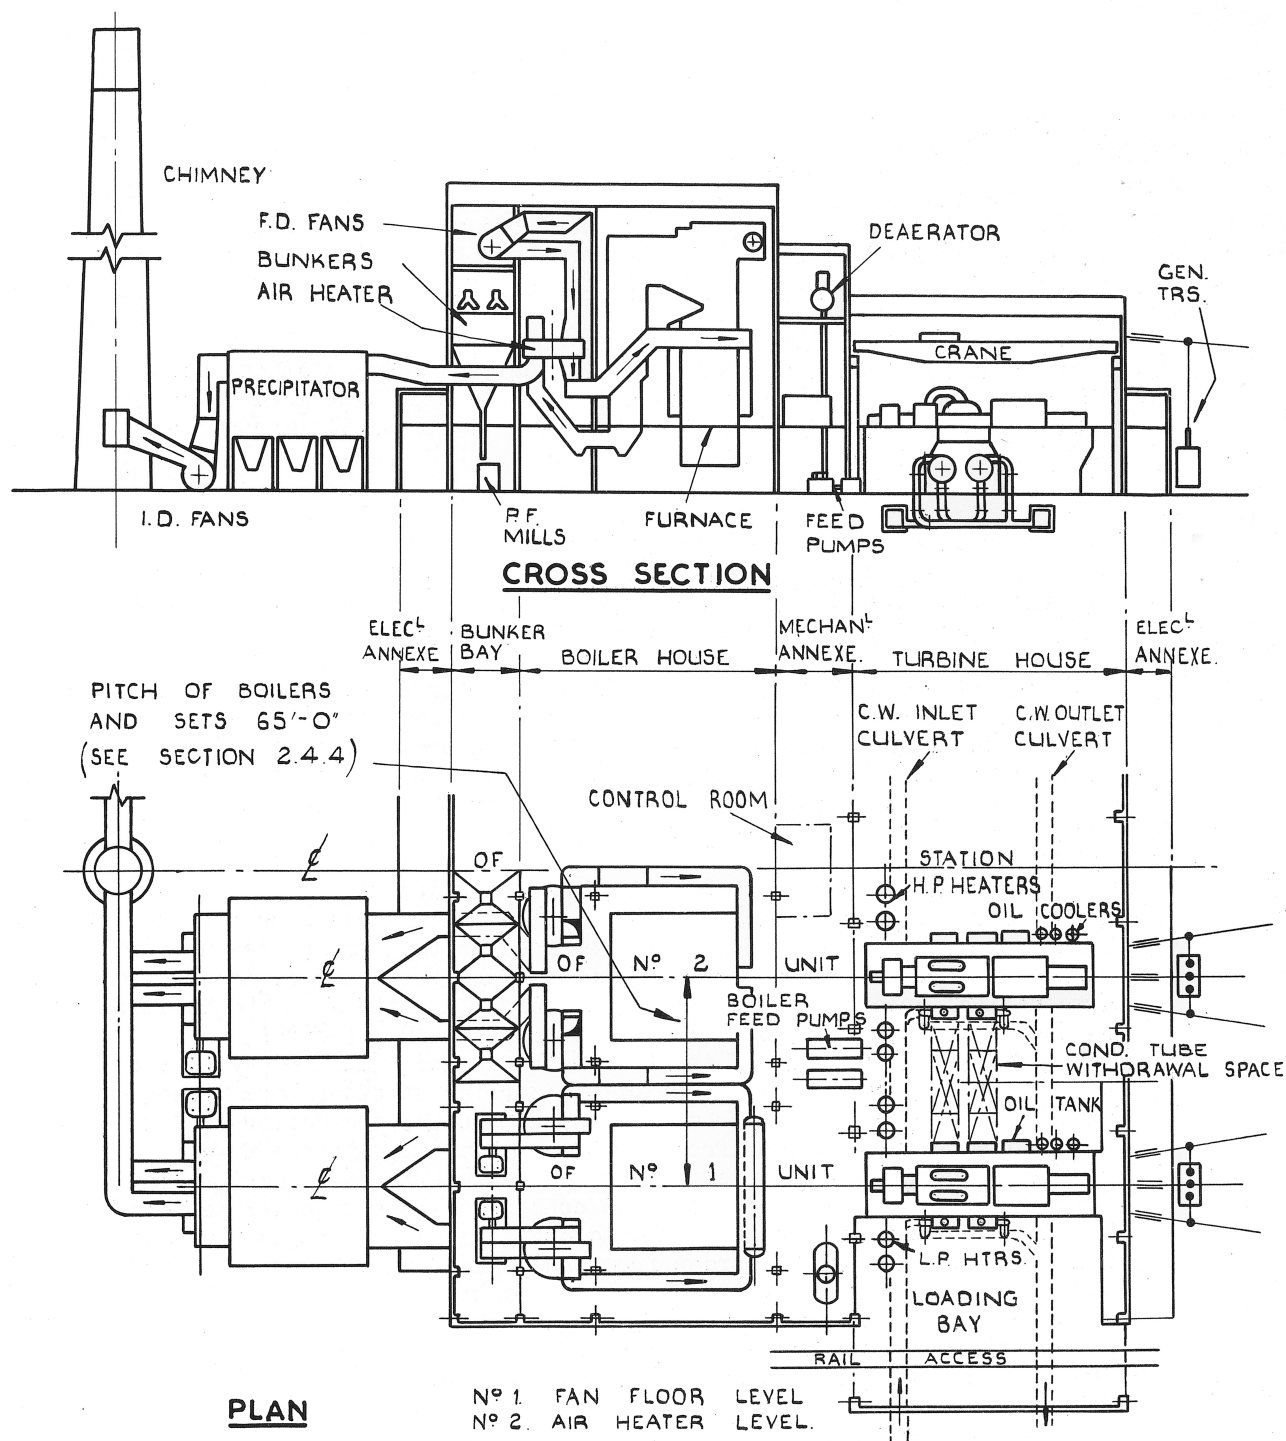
TYPICAL STATION ARRANGEMENT 4 × 60 M.W. UNITS (TRANSVERSE)
